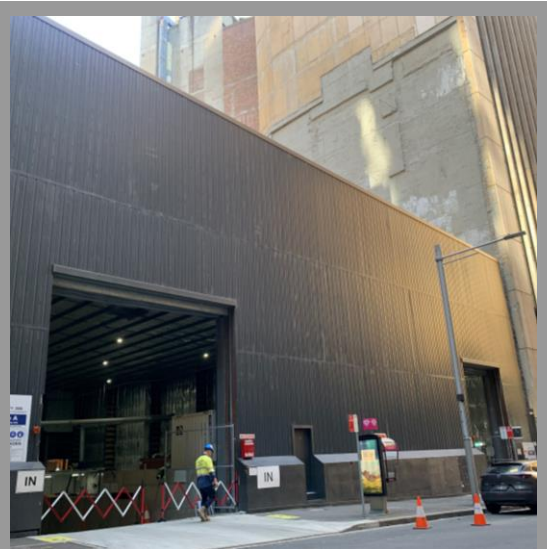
Construction site at 33 Bligh Street and existing office building at 37 Bligh Street
